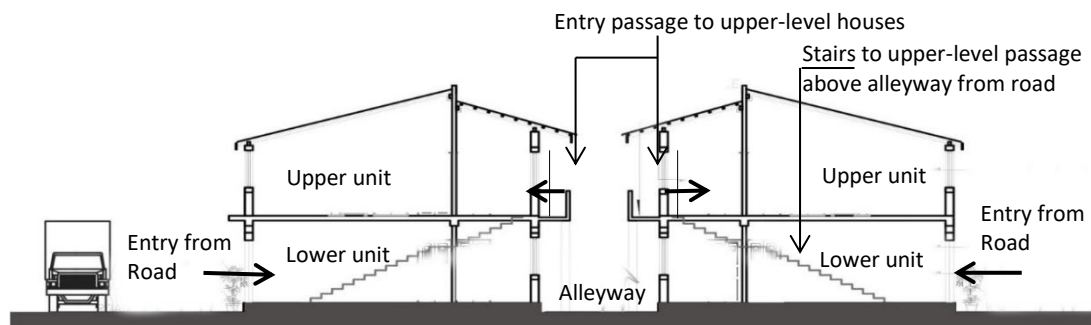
Concept of providing entrance from road to lower-level houses, and from passage above alleyway to upper-level houses
